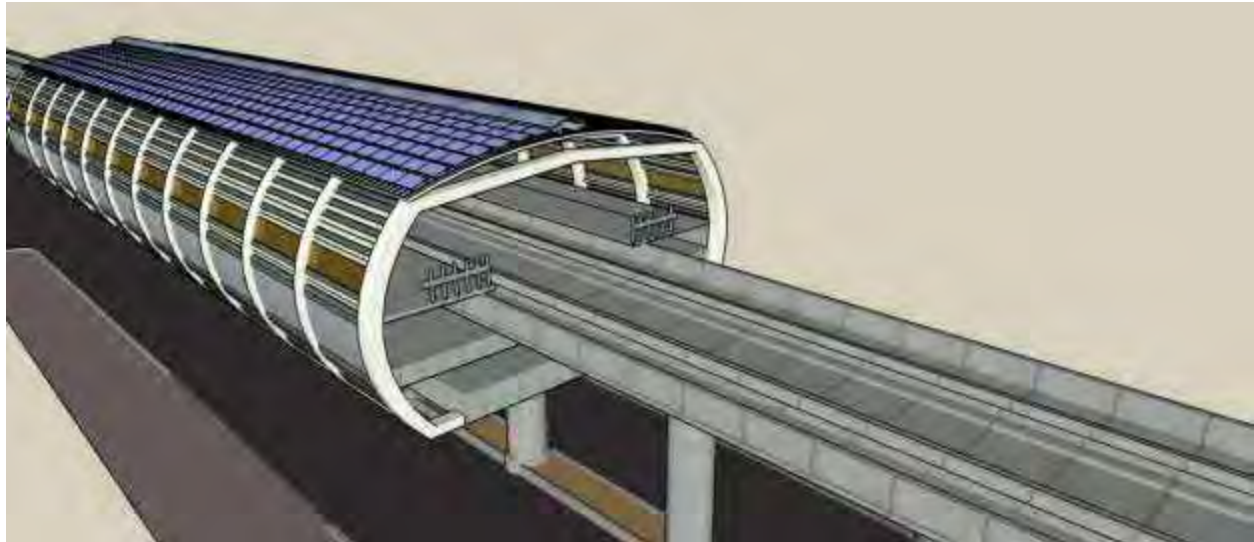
Typical Views of Solar Panels installation over station roof tops
